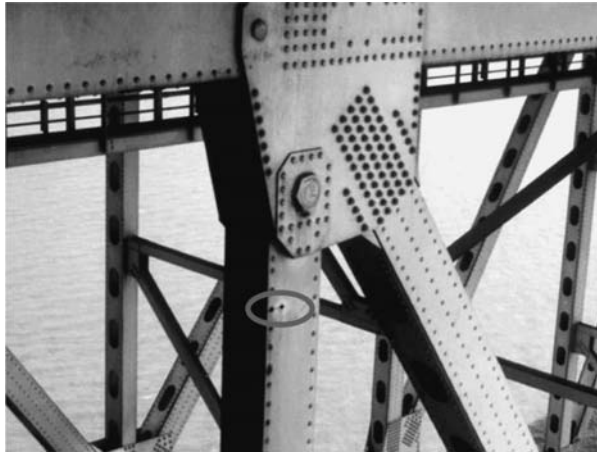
Riveted deck truss hanger with fatigue cracking from pin fixity.
